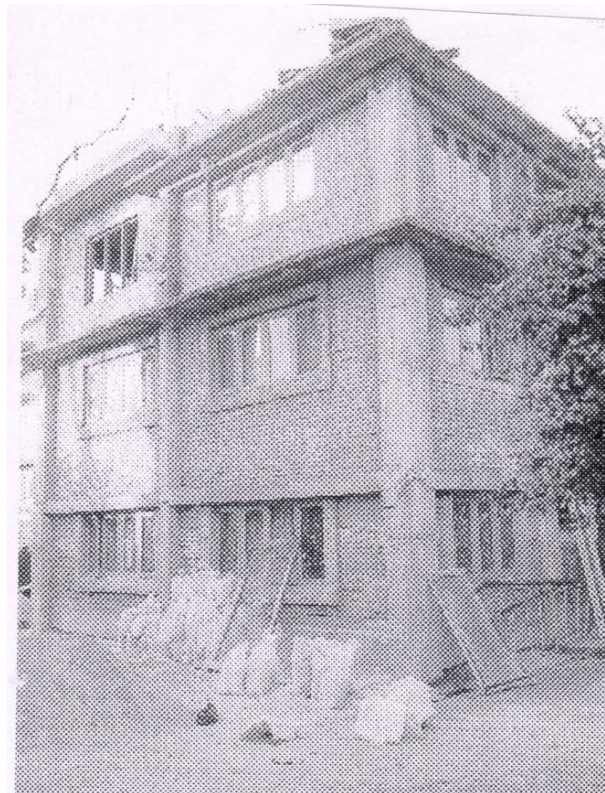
Lack of maintenance leading school building to severe deterioration. [NSET-Nepal's Archive]
